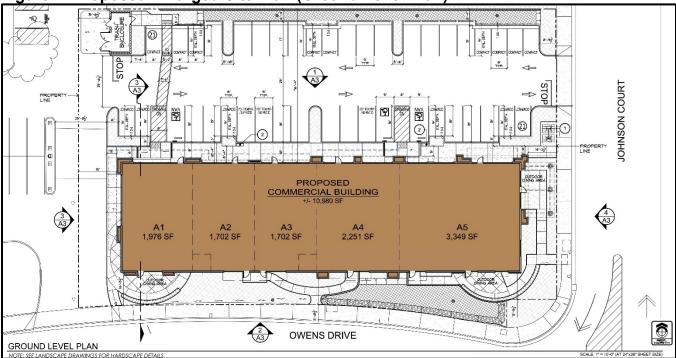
Proposed Enlarged Site Plan (Ground Level Plan)
